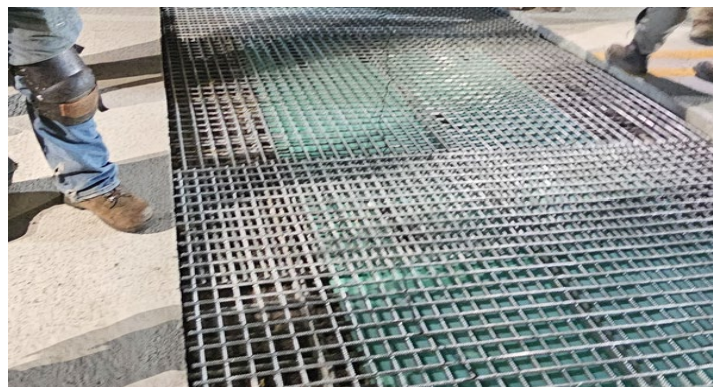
Link slab reinforcement prior to concrete placement using BCSA concrete.
